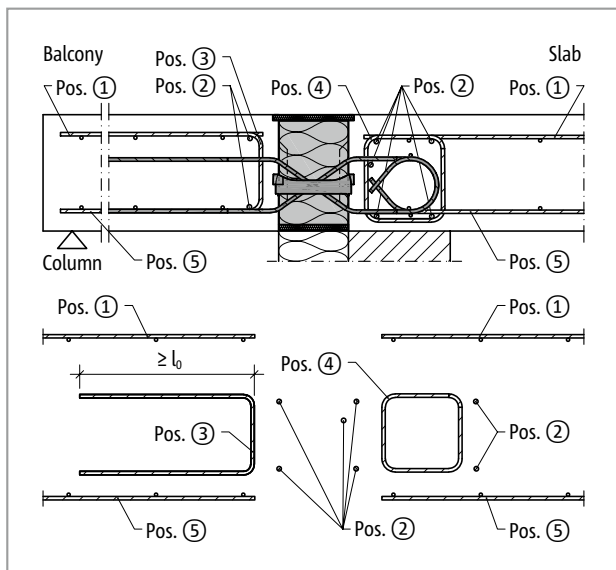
Schöck Isokorb® XT type Q-VV1 to VV4 on-site reinforcement
